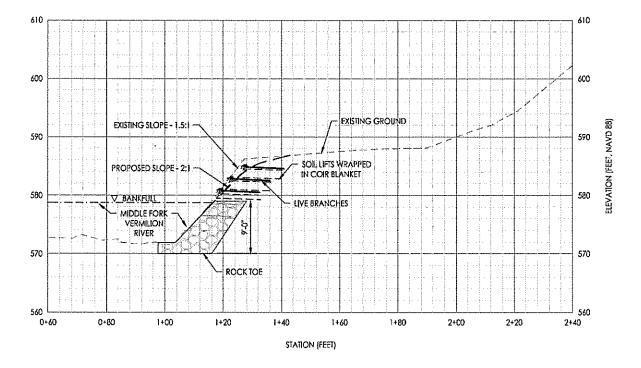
Rock Toe w/ Live Branch Layering (example section)
